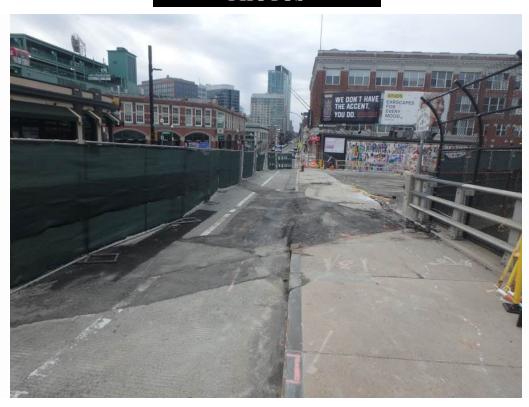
West sidewalk and part of travel lane, closed to pedestrian and vehicle traffic due to ongoing construction at parcel 12 (Southwest approach shown)
